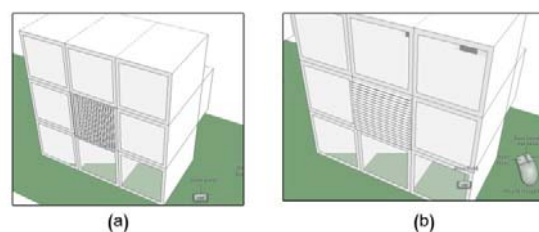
Office unit, virtual model on IES. (a) Vertical external louvers installation for the East and West façade, (b) horizontal external louvers installation for the south façade.
